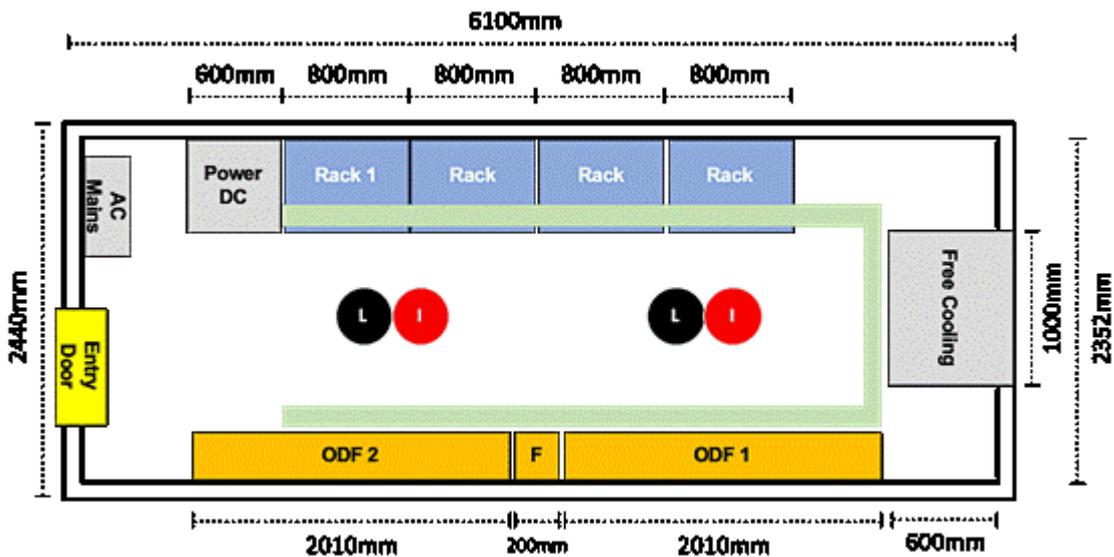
Typical size and internal location of equipment inside a POP (Type 1)
